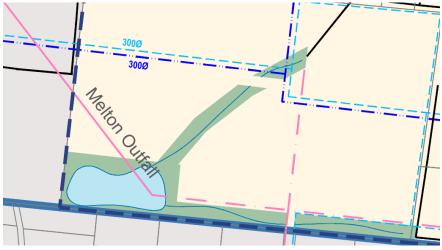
Location of the Melton Outfall sewer, from Plan 14 of the Toolern PSP (Amended 2014)
